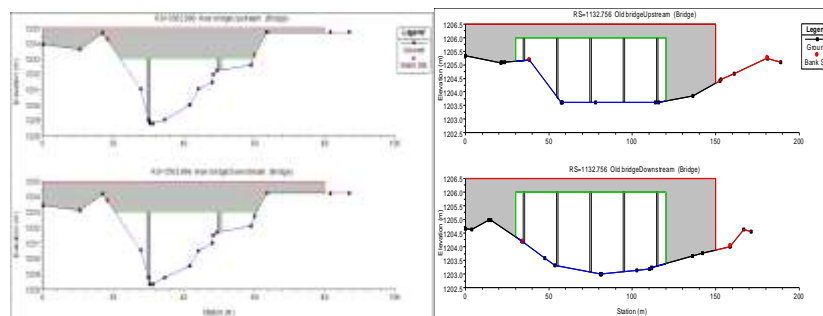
Bridge modelling using HEC RAS (Left: New bridge upstream and downstream cross sections; Right: old bridge upstream and downstream cross sections)
